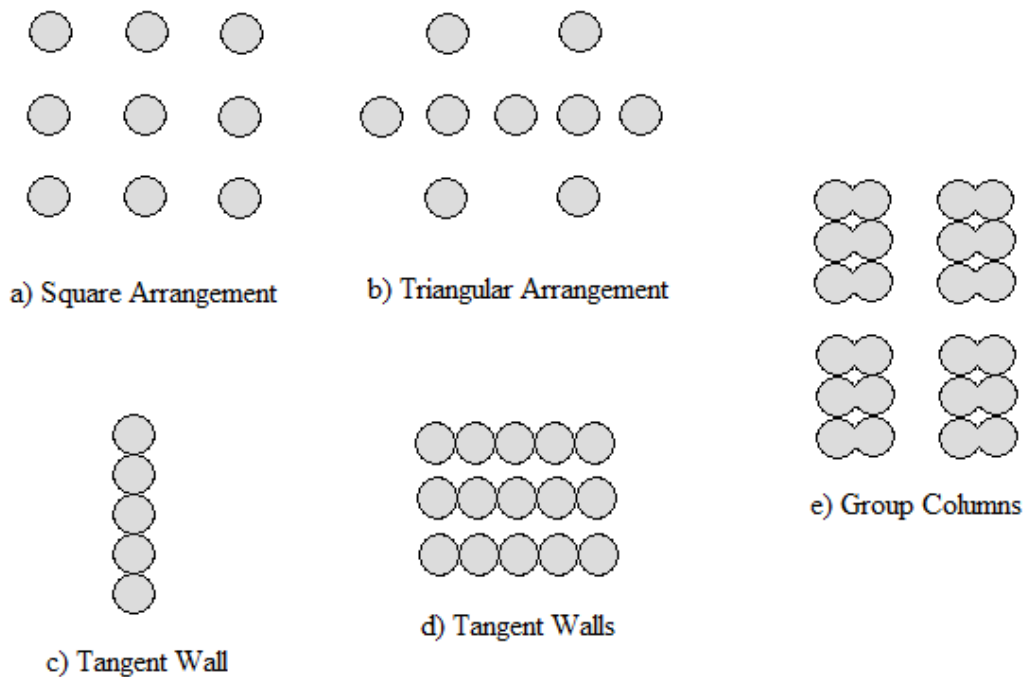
Typical Arrangement of Grouped Deep Mixed Columns (Topolnicki, 2004)
